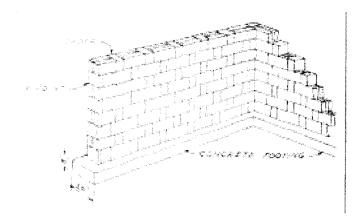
Low Cash-Cost House Rowlock Wall Detail. (Source: Low Cash-Cost Housing)
